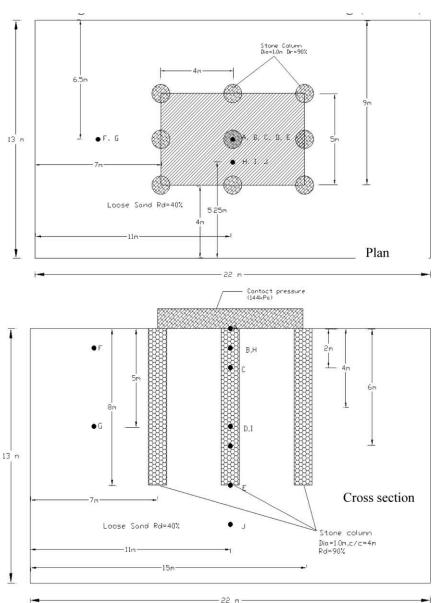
b. Benchmark model with Footing and stone Column (Model 2)
